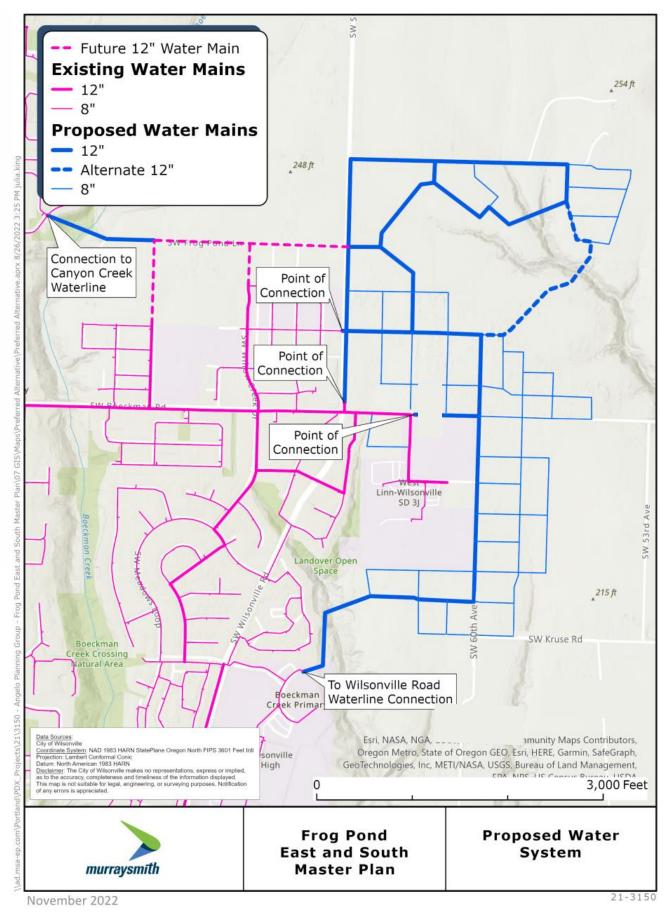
illustrates the Master Plan's water system layout for the East and South neighborhoods, including off-site improvements needed to serve the area. A looped system consisting of 12-inch and 8-inch distribution mains is proposed for supply of domestic water to Frog Pond East and South.
